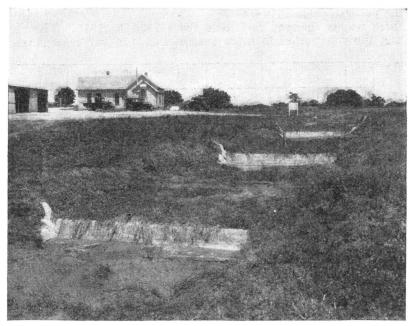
Concrete check dams in terrace outlet ditch with Bermuda grass growing on sides and bottom.
